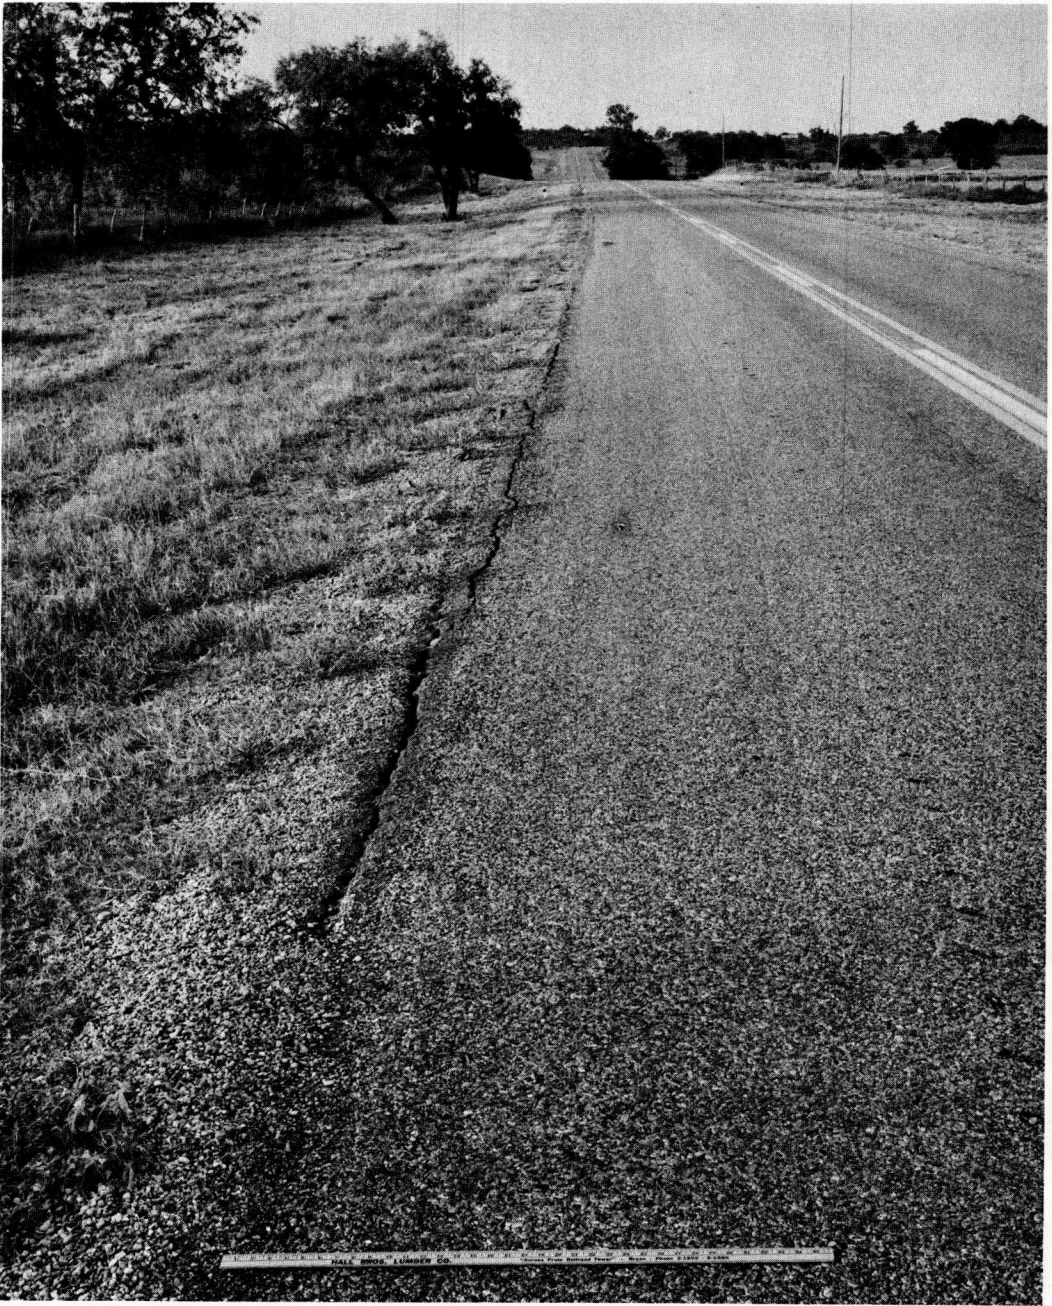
On this highly plastic clay, shrinkage cracks form at edge of pavement surface.
